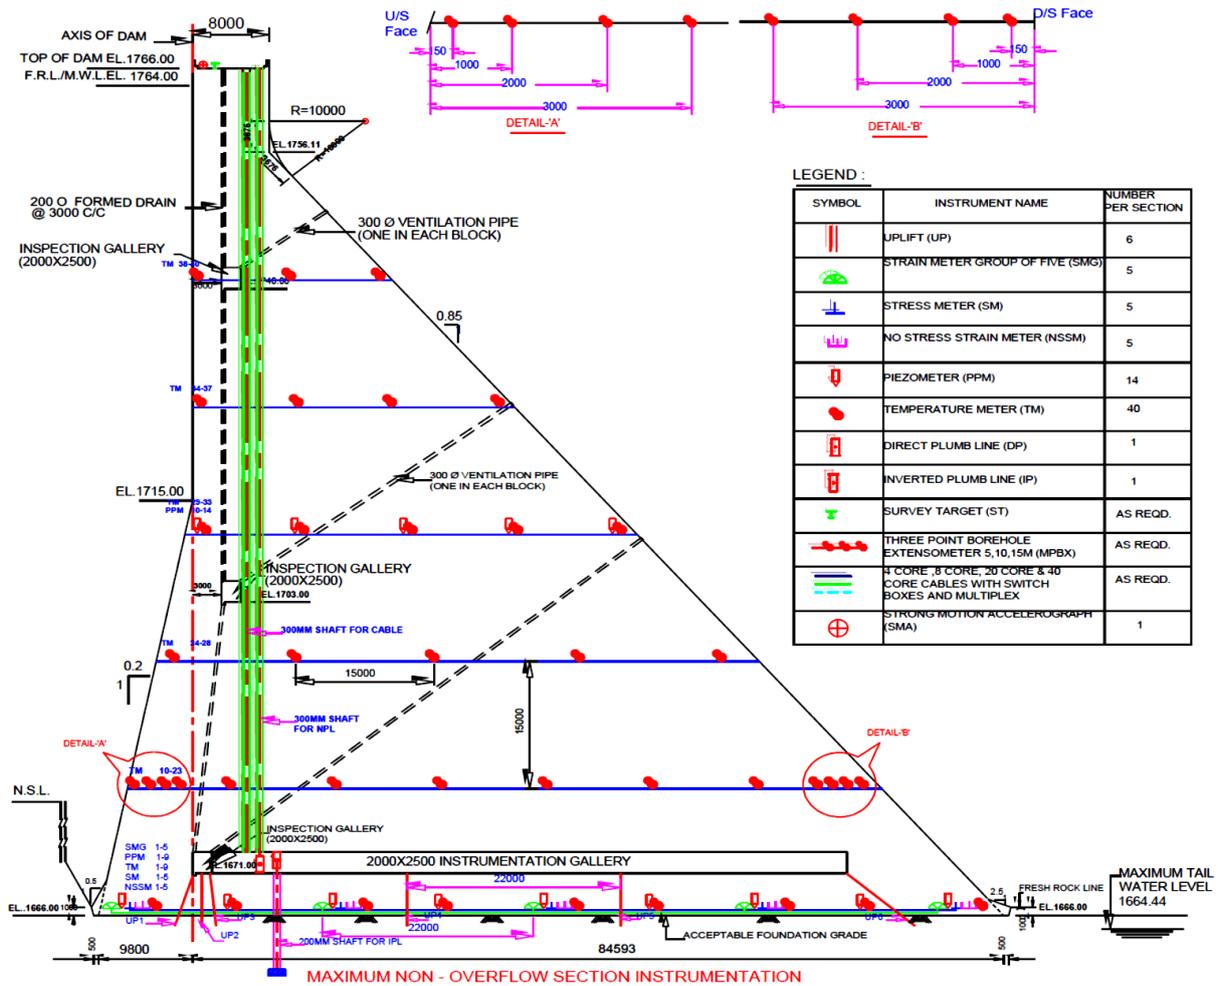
Illustration of a typical monitoring system for a concrete or masonry dam (2) (CWC, 2018)
